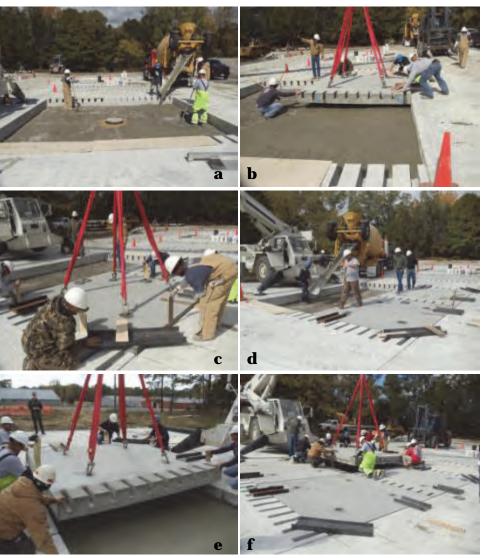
Installation of Repair 3 panels: a) pedestal location; b) placing first panel; c) using shims to place second panel; d) placing flowable fill for third and fourth panels; e) placing third panel; f) placing fourth panel.
